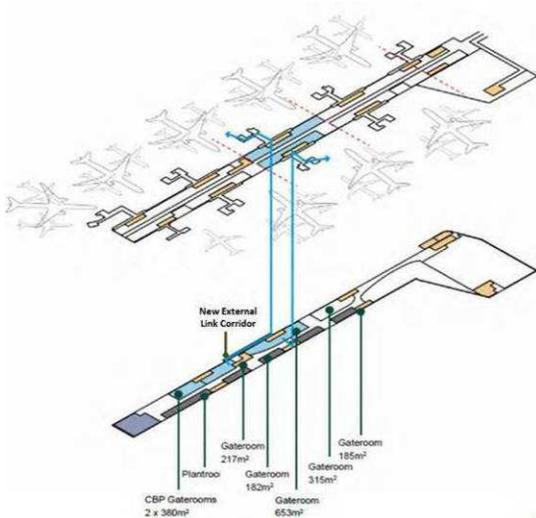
Axonometric view of Pier 4 Apron and First floor
